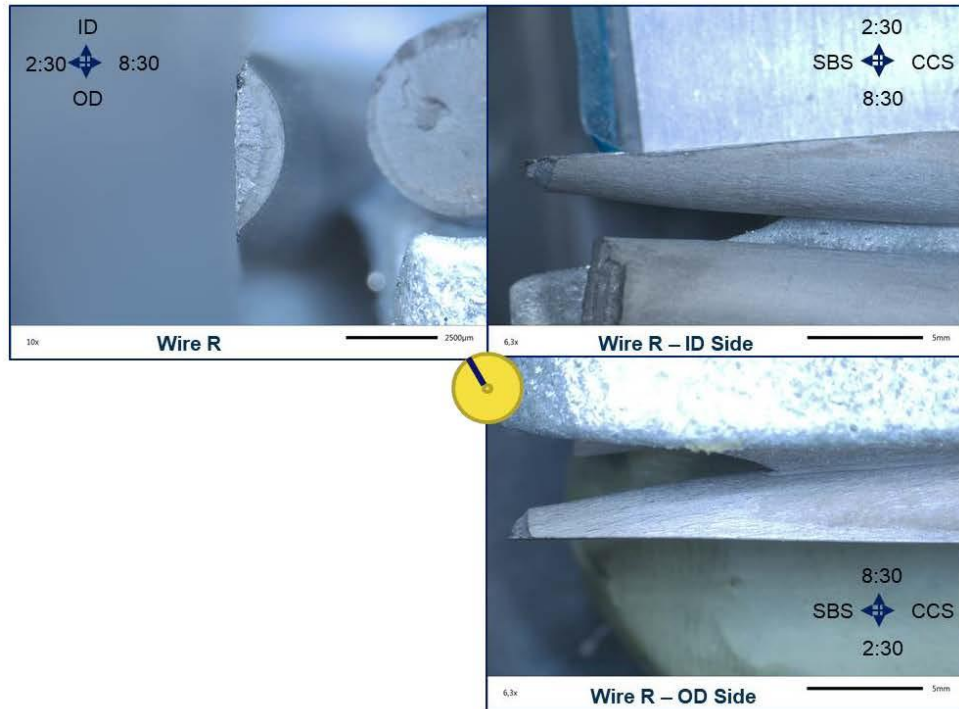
Stereomicroscope images of wire R (11:30). The fracture surface of wire R was cut through during the initial longitudinal cut of the socket cavity.
